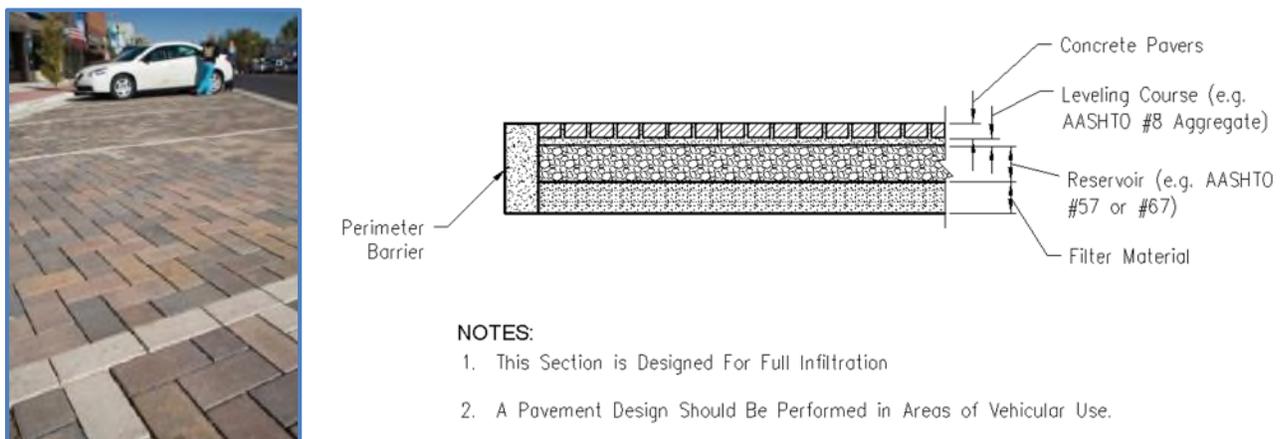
Example PICP installation (left). Typical PICP detail (right).
